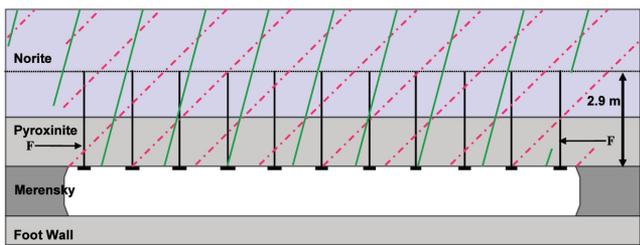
3 m cable anchors with 45° and 75° joints in a 20 m panel
